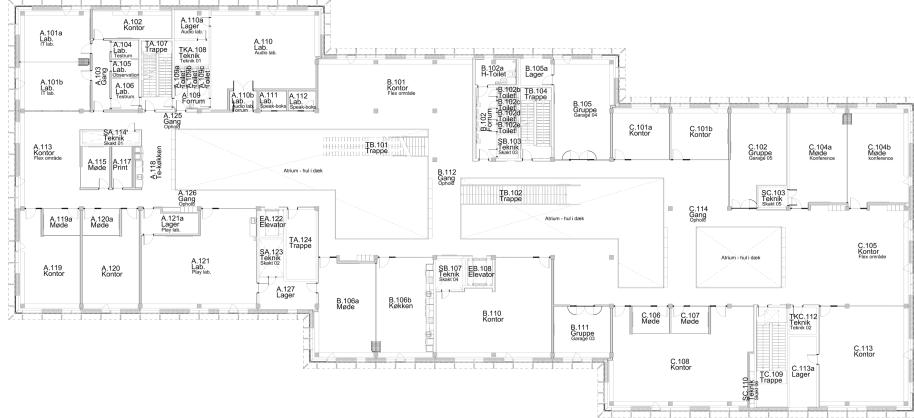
The floorplan of the first floor of the AAU Innovate building.
